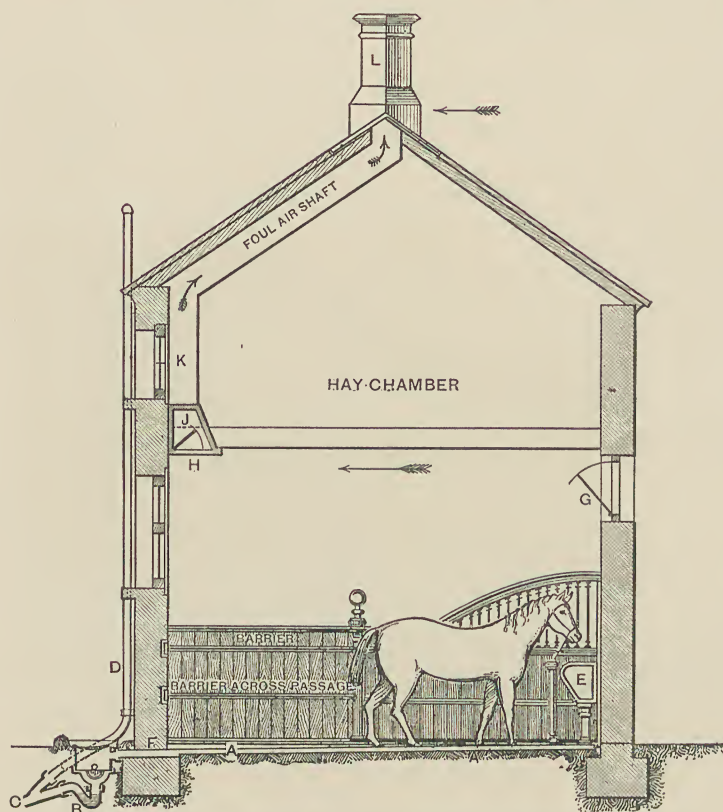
Section through Stable and Hay-loft, showing Drainage and Ventilation.
